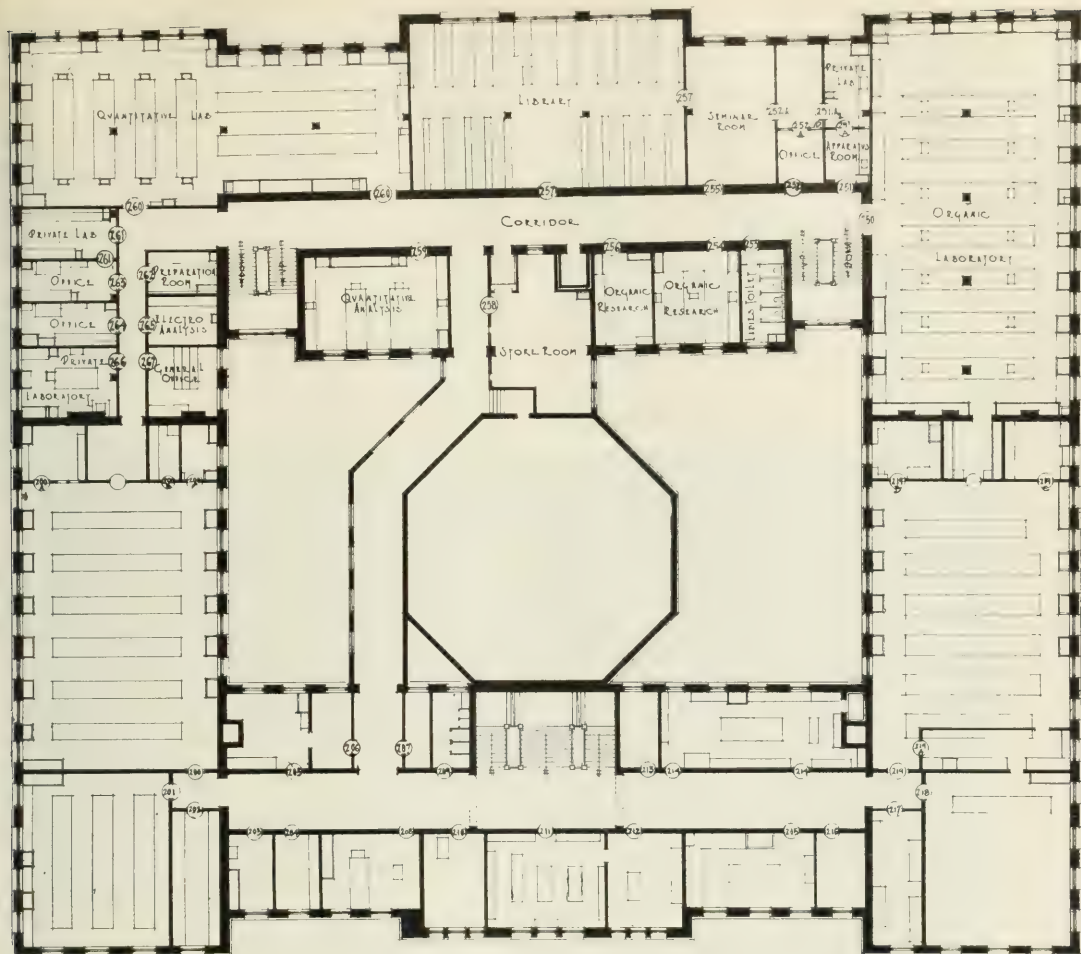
FIG. III.—PLAN OF SECOND FLOOR—CHEMISTRY BUILDING
